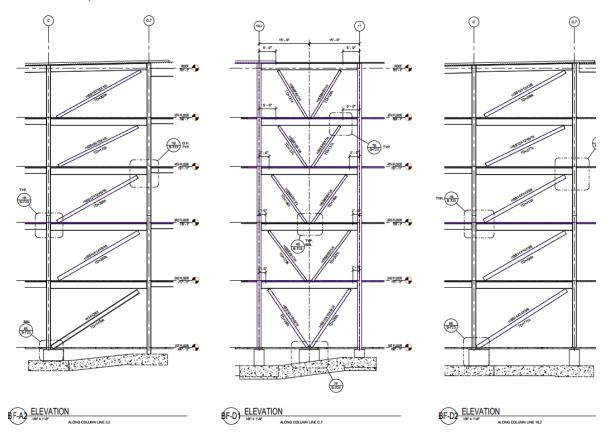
SAMPLE BRACED FRAME ELEVATIONS
